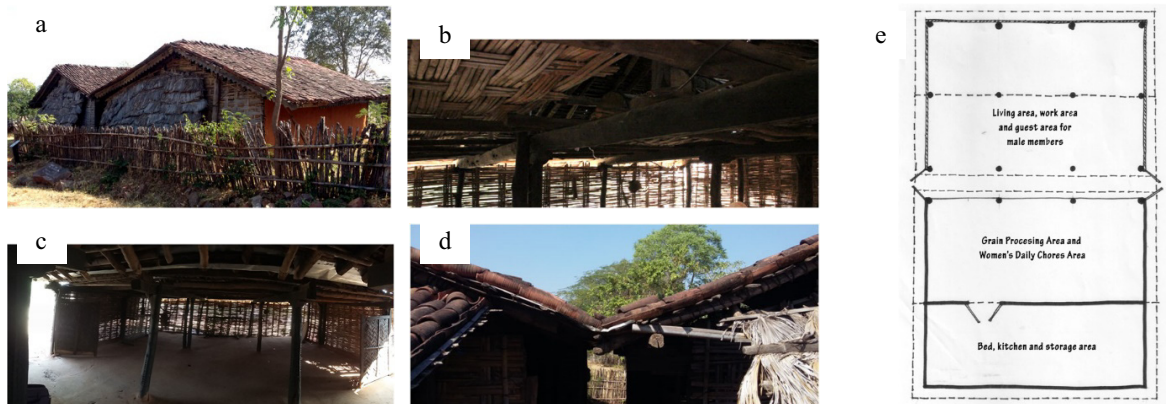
(a) Twin hut form of Rathwa House, (b) Double roof and loft, (c) The seating area, (d) Junction of roof eaves. (e) Plan
